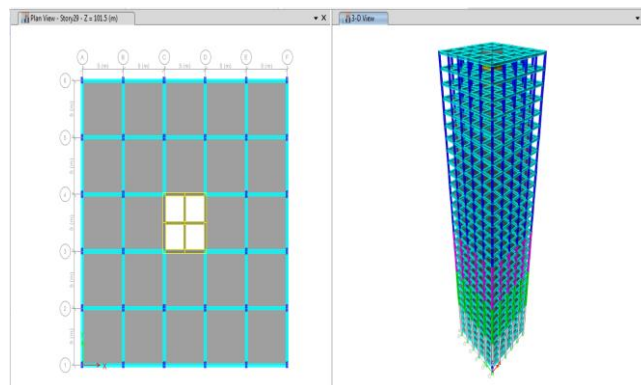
Plan and 3-D view of the Open RC Frame Structure
